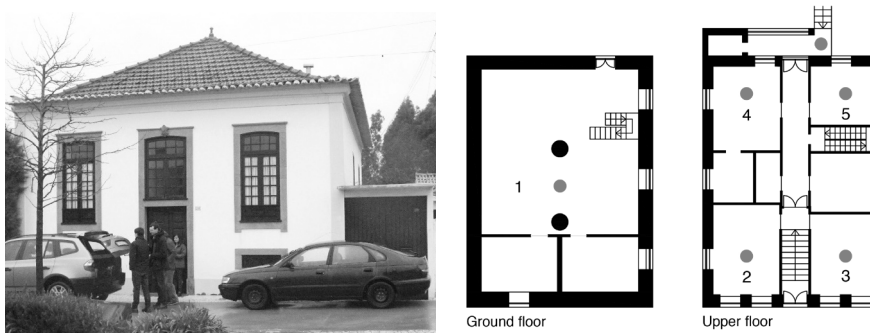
(left) External view; (right) Floor plans showing the position of measuring instruments (1—living room; 2—bedroom 2; 3—bedroom1; 4—kitchen; 5—bedroom3).
